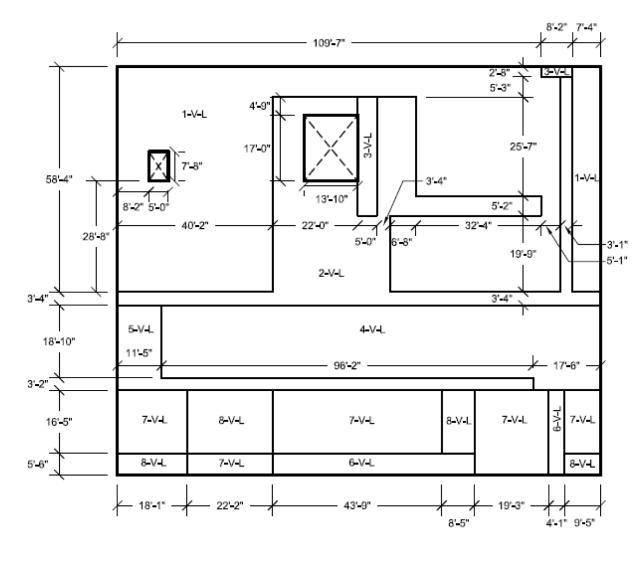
H.3-21 East Wall Looking West Vertical Reinforcement Zones Far Side Face
